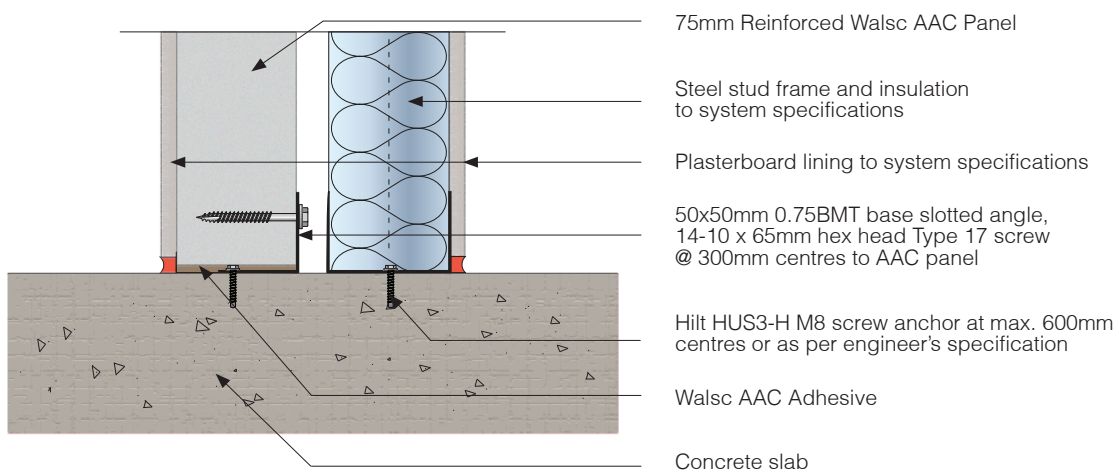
Internal Cavity Wall System Bottom Fixing Detail
